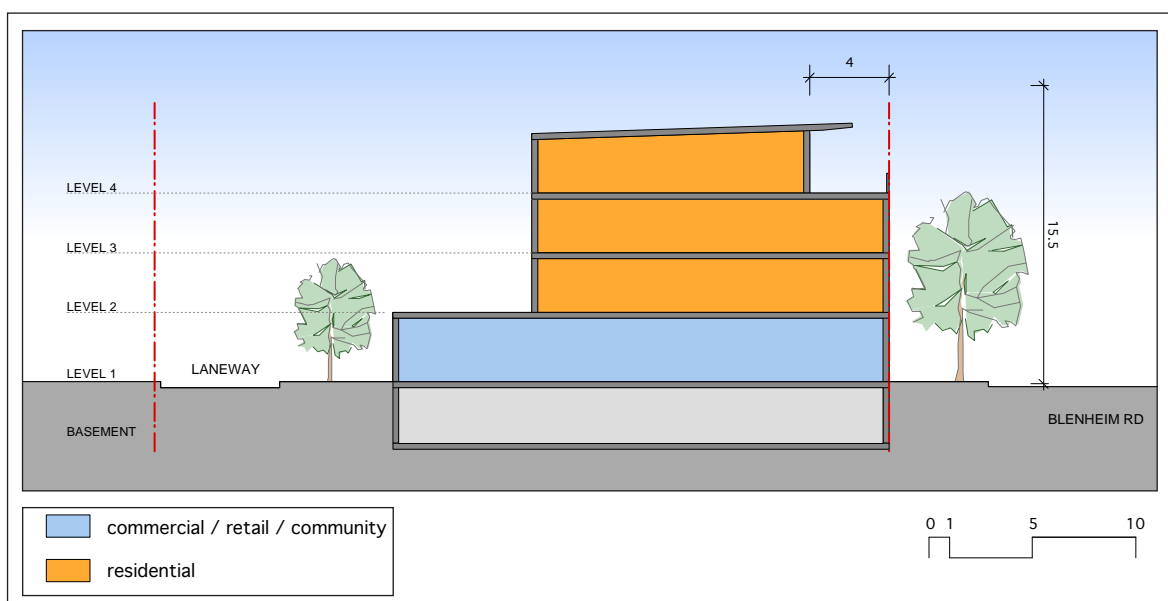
Blenheim Road Small Centre Building Height Control - Cross Section
